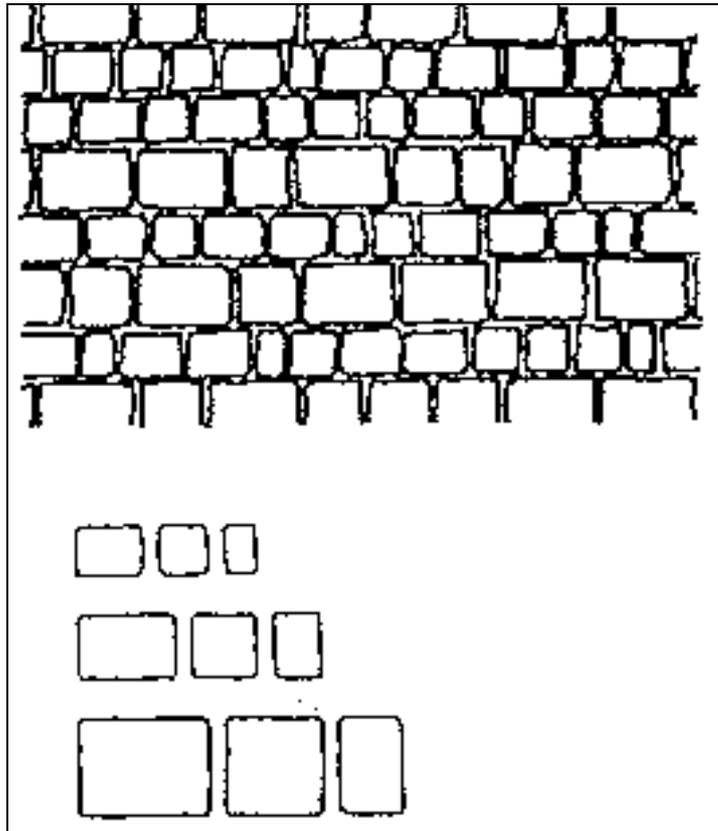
Sketch showing different sized concrete brick paving blocks that can be used together to give a coursed random appearance.
